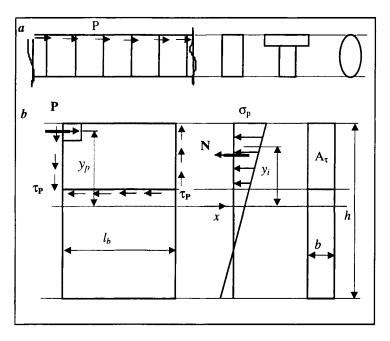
Prestressing forces in bridge beam (a) and stress distribution in the bridge segment due to prestressing force (b)
